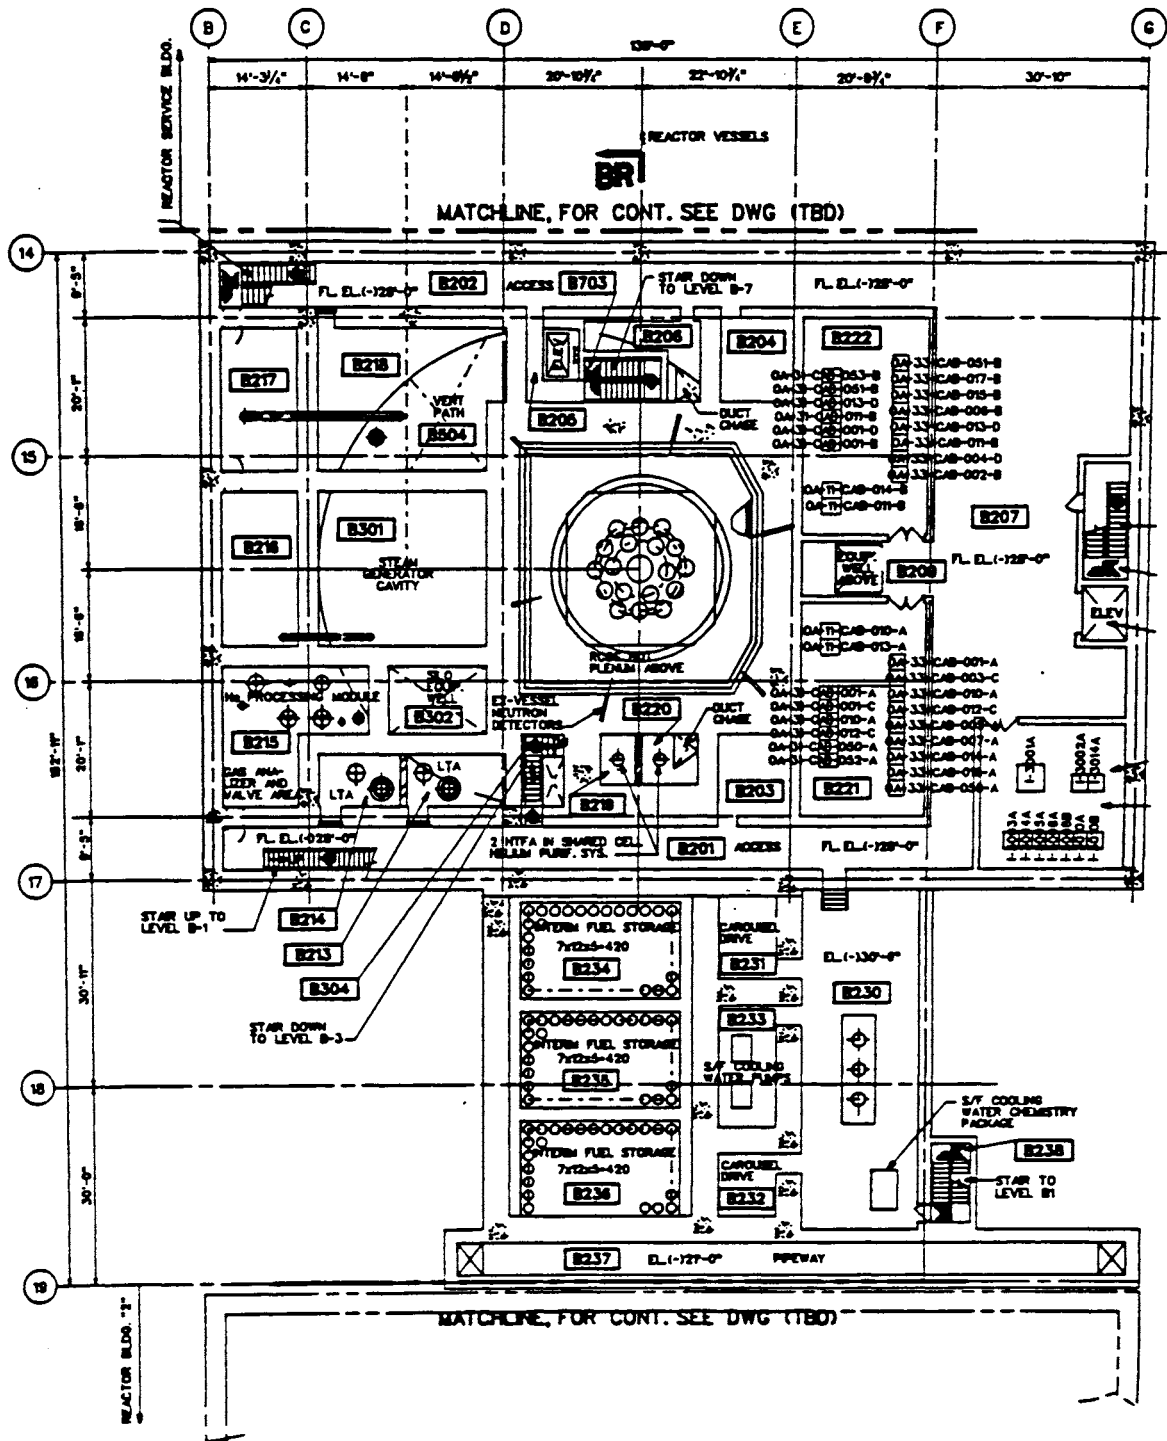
REACTOR BUILDING - PLAN AT LEVEL B2
